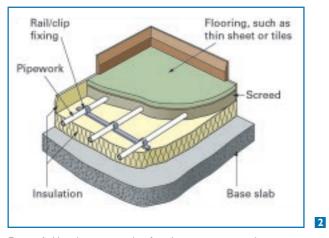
Use this image in briefing documentation to show a typical underfloor heating construction. ©BSRIA.
